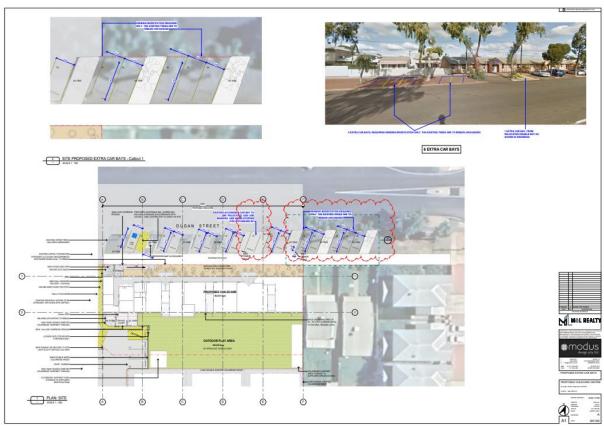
Proposed Dugan Street Car Parking Plan: Lot 13 (No 67-71) Dugan Street, Kalgoorlie.
